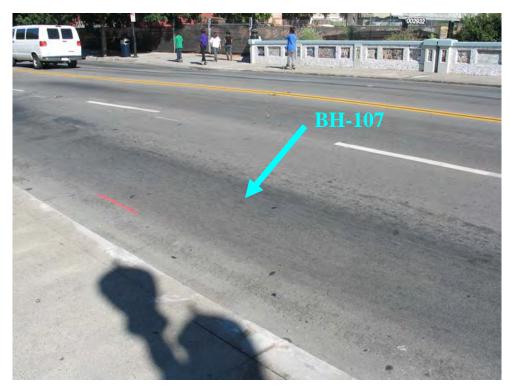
Photo of Planned BH-107 Location on Coyote Creek Bridge, Looking Southeast from north sidewalk, south end of Pier No. 3 located at joint in south guardrail.
